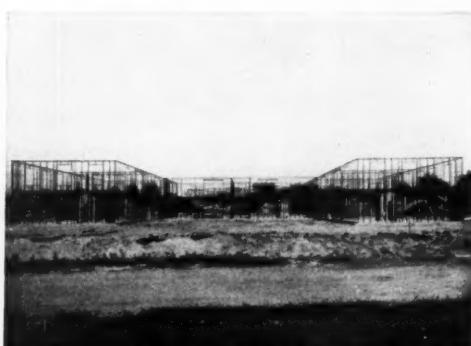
Framework for one of many multiple family apartments built with all-welded steel construction. The Estabrook Homes project is located in Shorewood, Milwaukee, Wisconsin.
